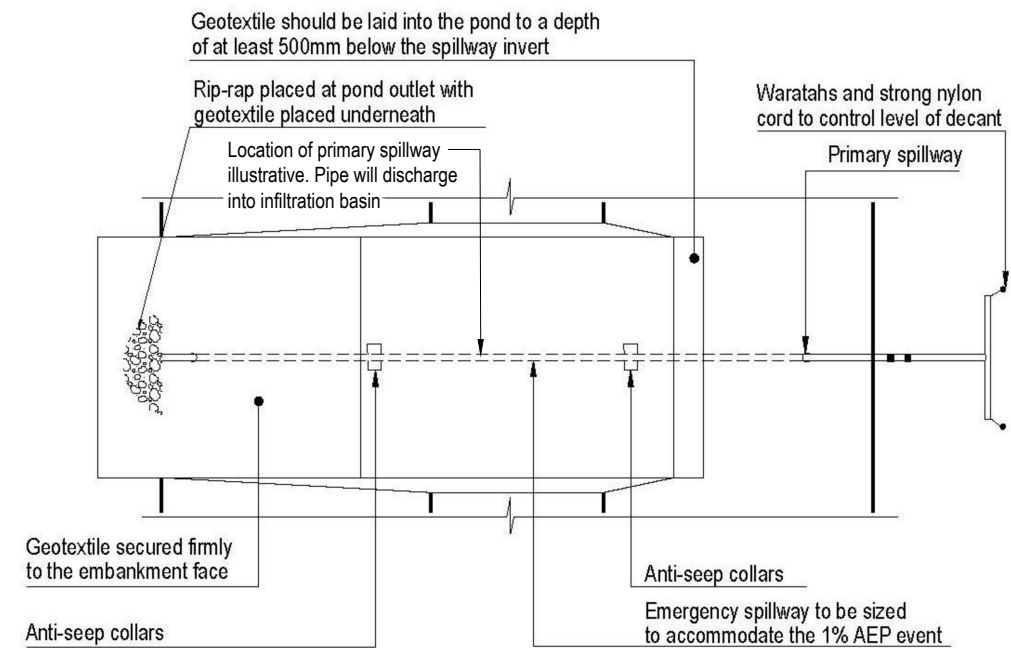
PLAN OF OUTLET FOR <1.5ha CATCHMENT
